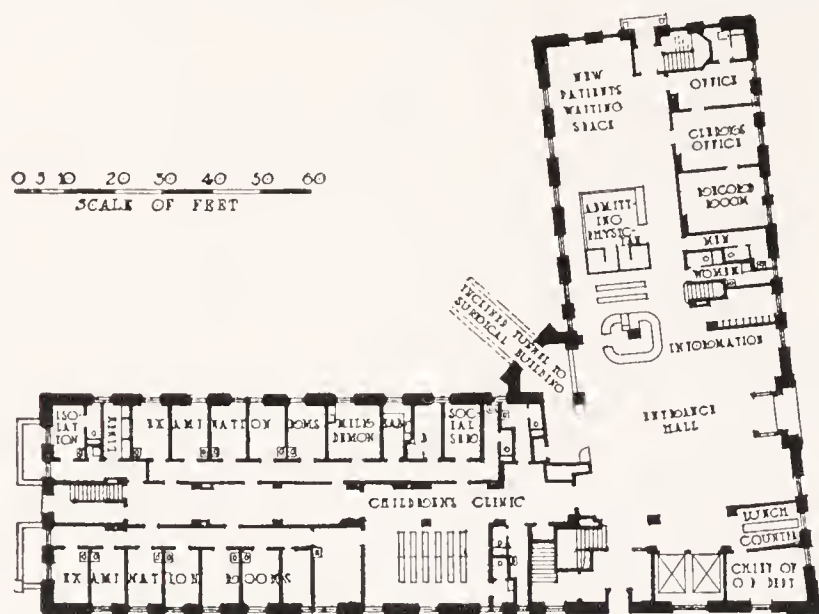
FIRST FLOOR, EAST NEW YORK HOSPITAL OUT-PATIENT DEPARTMENT
